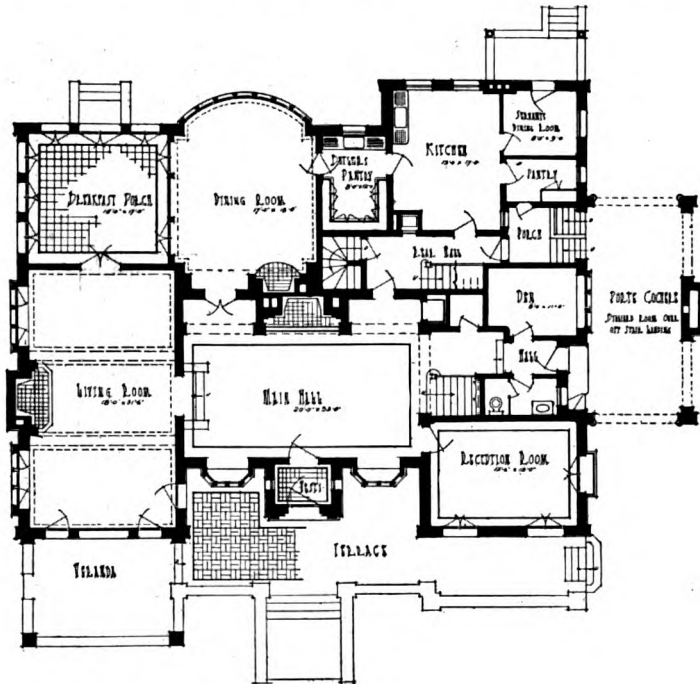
VIEW AND FIRST FLOOR PLAN—
